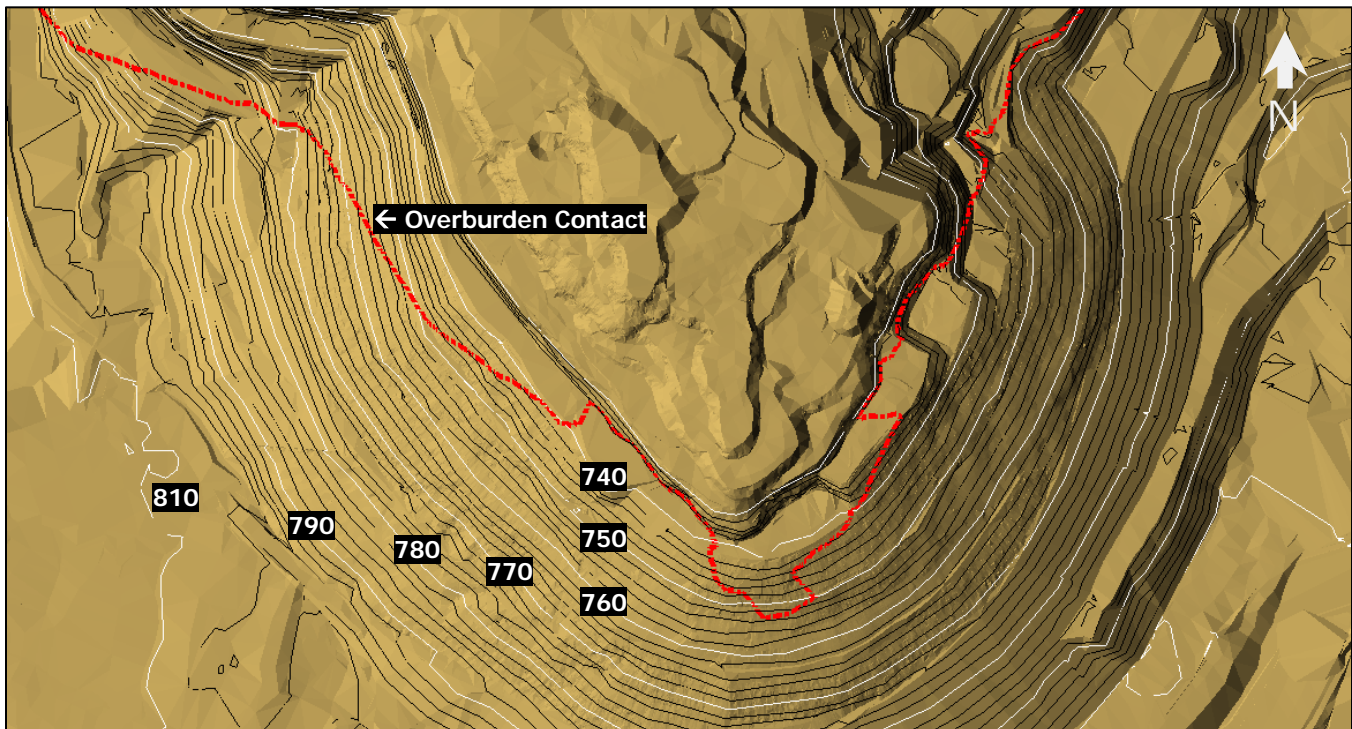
Overburden contact (red) where it intersects the final pre-failure as-built of the south wall.
